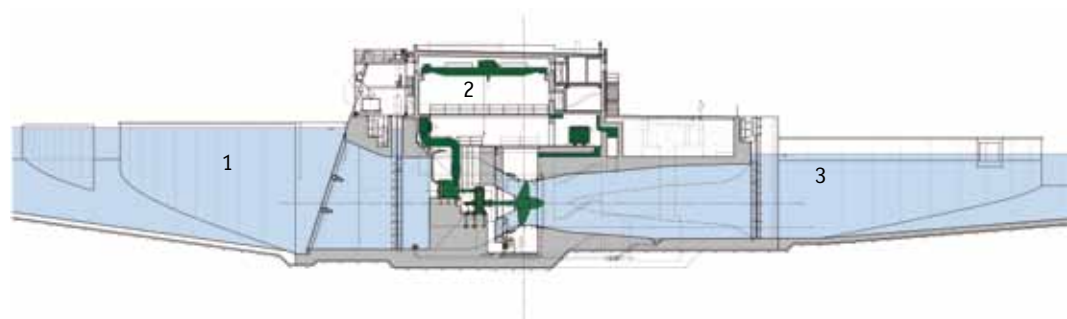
Litoměřice SHPP – longitudinal section: 1 – inlet structure, 2 – machine room, 3 – outlet structure (taken from: Aquatis, a. s.).
